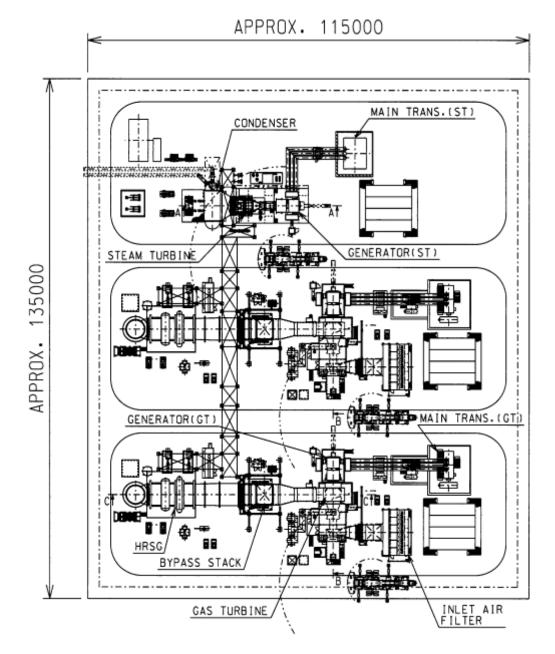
Typical GTCC Layout of Heavy Duty GT with Seawater Cooling System
